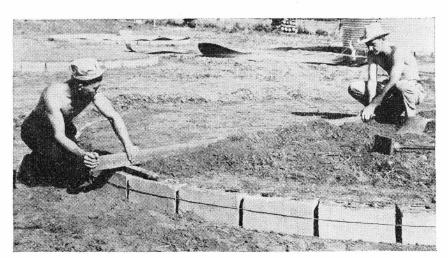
Concrete block foundation for round steel bin. Note No. 9 wire holding blocks in place. Earth or gravel fill is well compacted.
